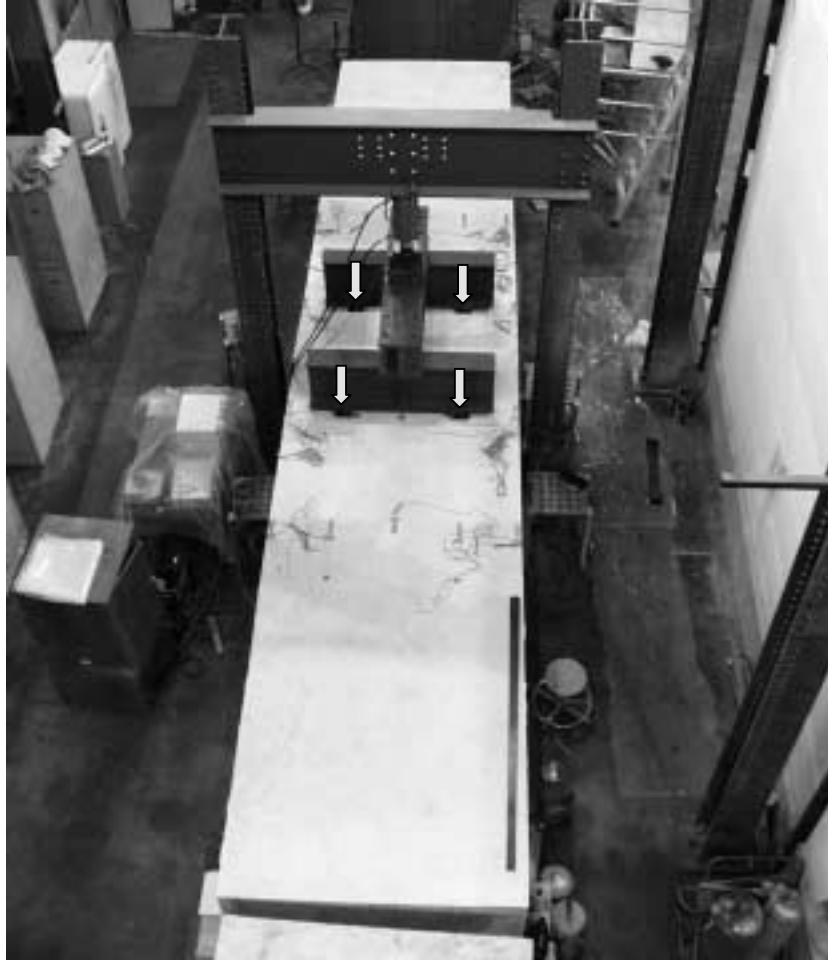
Overhead View of Pan-Girder Specimen Showing the Location of Loading Points
